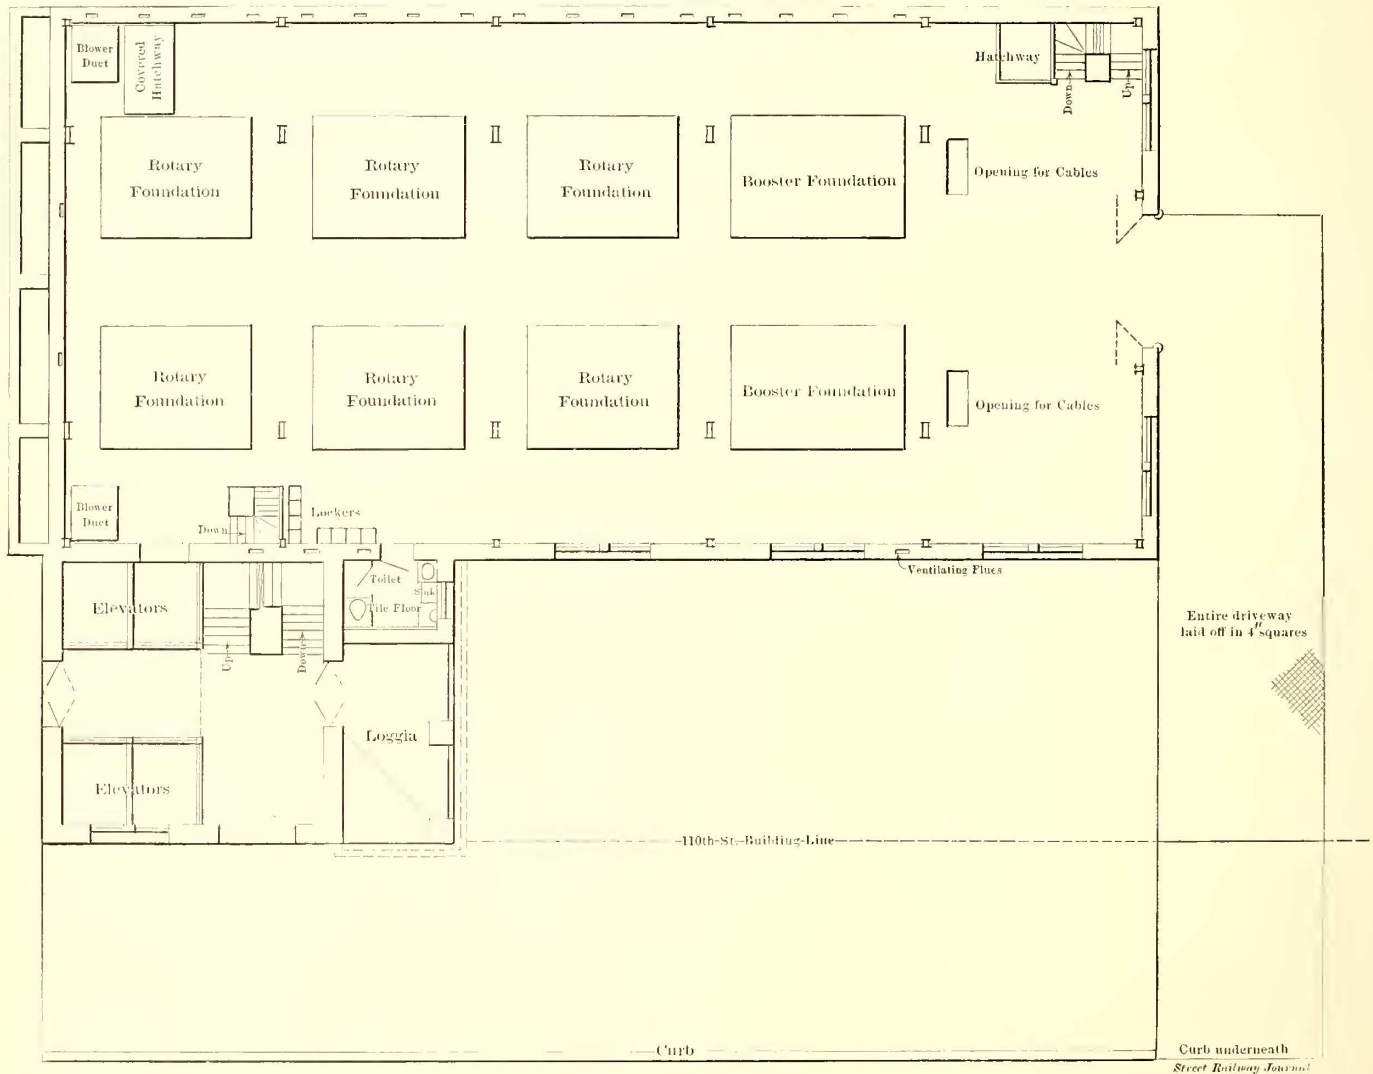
PLAN OF FIRST FLOOR OF SUB-STATION NO. 4, SHOWING ROTARY ROOM, AND ELEVATORS FOR PASSENGER TOWER
